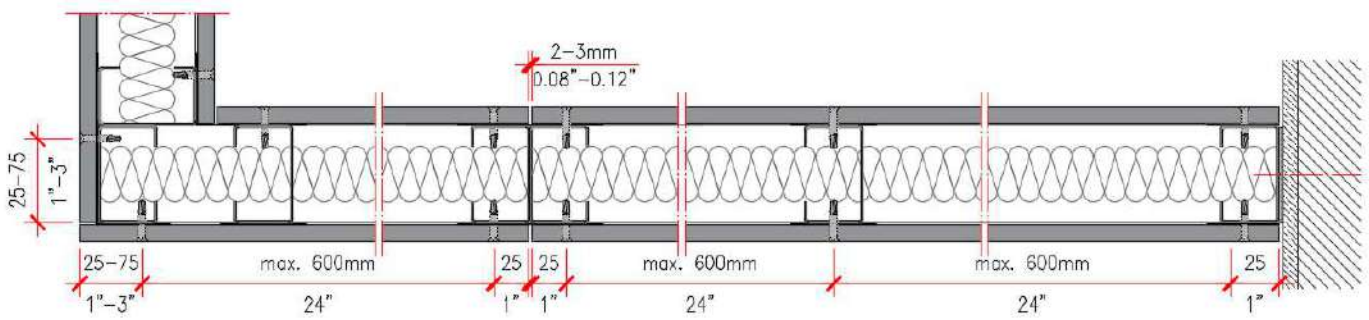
Horizontal section of the wall, galvanized steel structure
